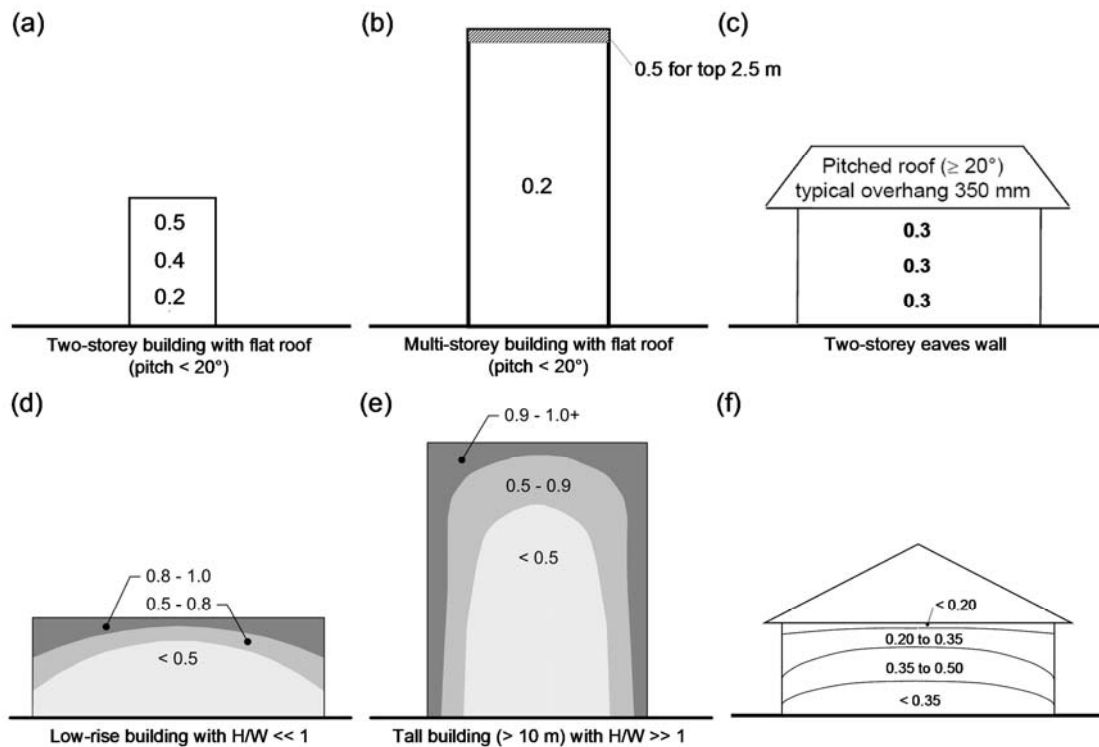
(a-c) ISO wall factors (W) on the windward facade of a two-storey building with flat roof, a multi-storey building with flat roof and a two-storey eaves building (modified from ISO (2009)); (d-f) Contours of Straube and Burnett's rain admittance factor (RAF) on the windward facades of a wide low-rise building with flat roof, a high-rise building and a low-rise building with pitched roof (Straube, 1998, Straube and Burnett, 2000).
